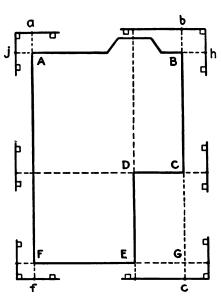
SETTING BATTER-BOARDS FOR A BUILDING.
